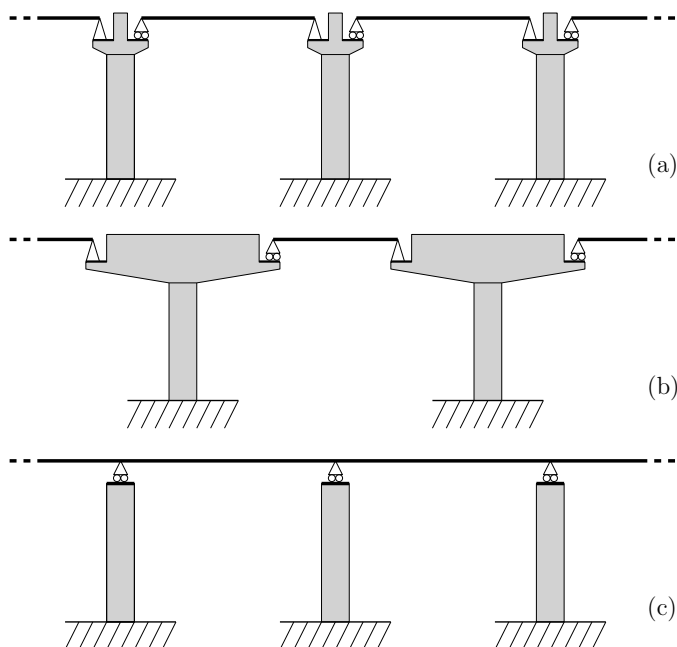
Sketch of typical beam arrangements in existing concrete bridges.
